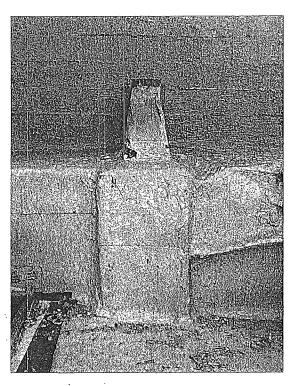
Detail view of open flue at southern parapet wall (photograph taken on 02/27/2018).
